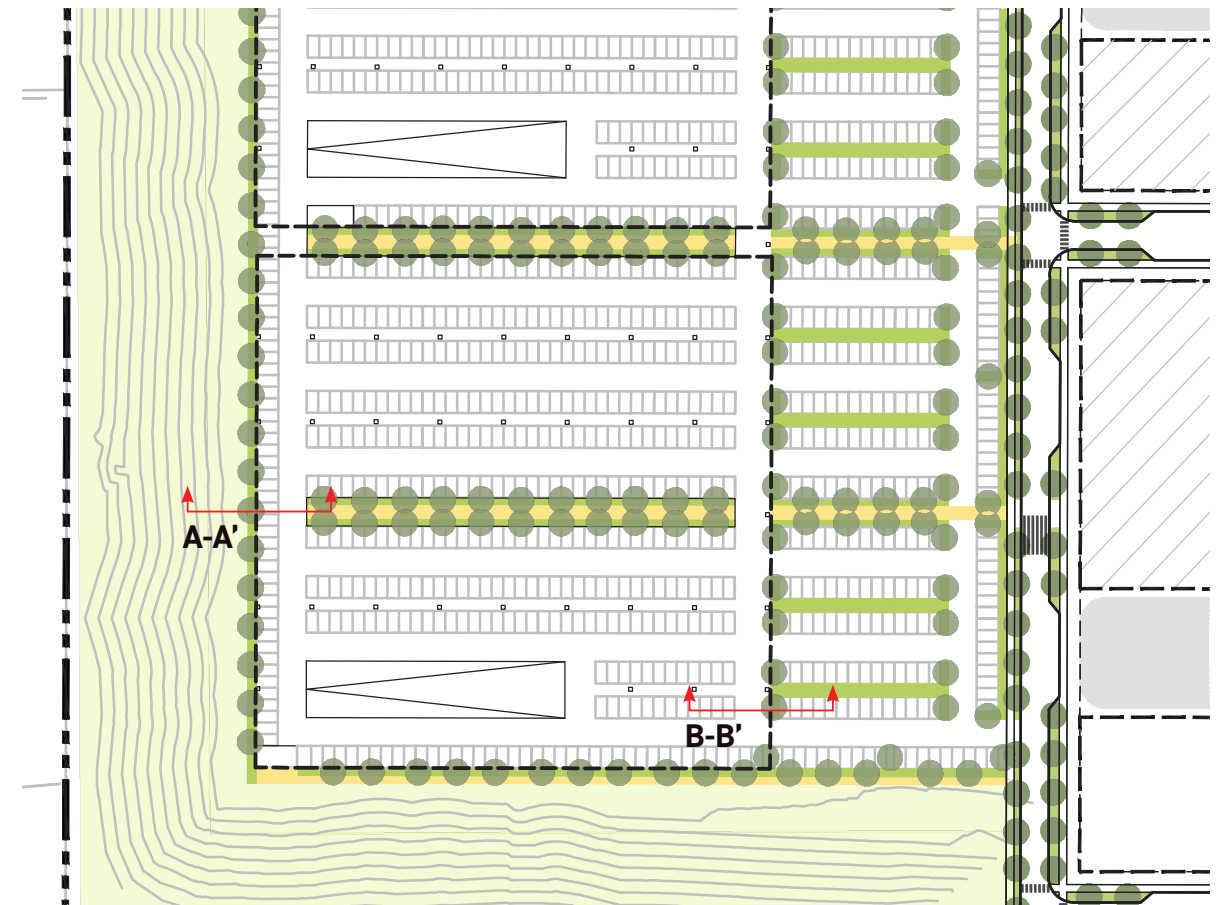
POTENTIAL PARKING OPTIONS
